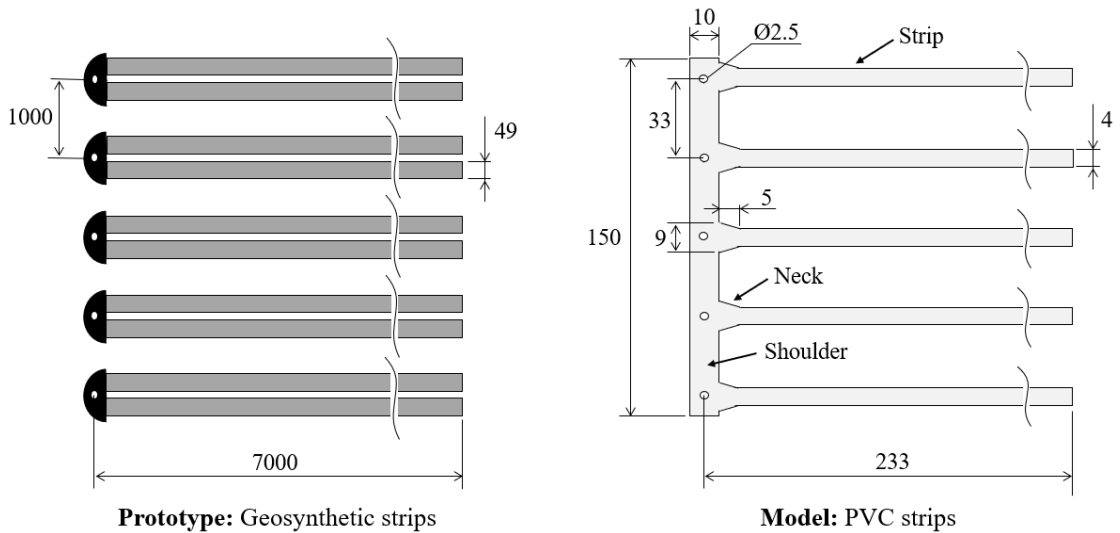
Plan view sketch of the extensible reinforcement used in the prototype and model. Sketch is not drawn-to-scale and all dimensions are in millimetres.
